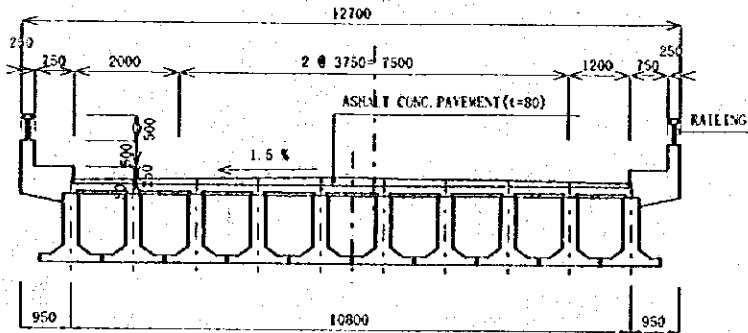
Cross Sectional Details of Super-structure Type 3 Girder
